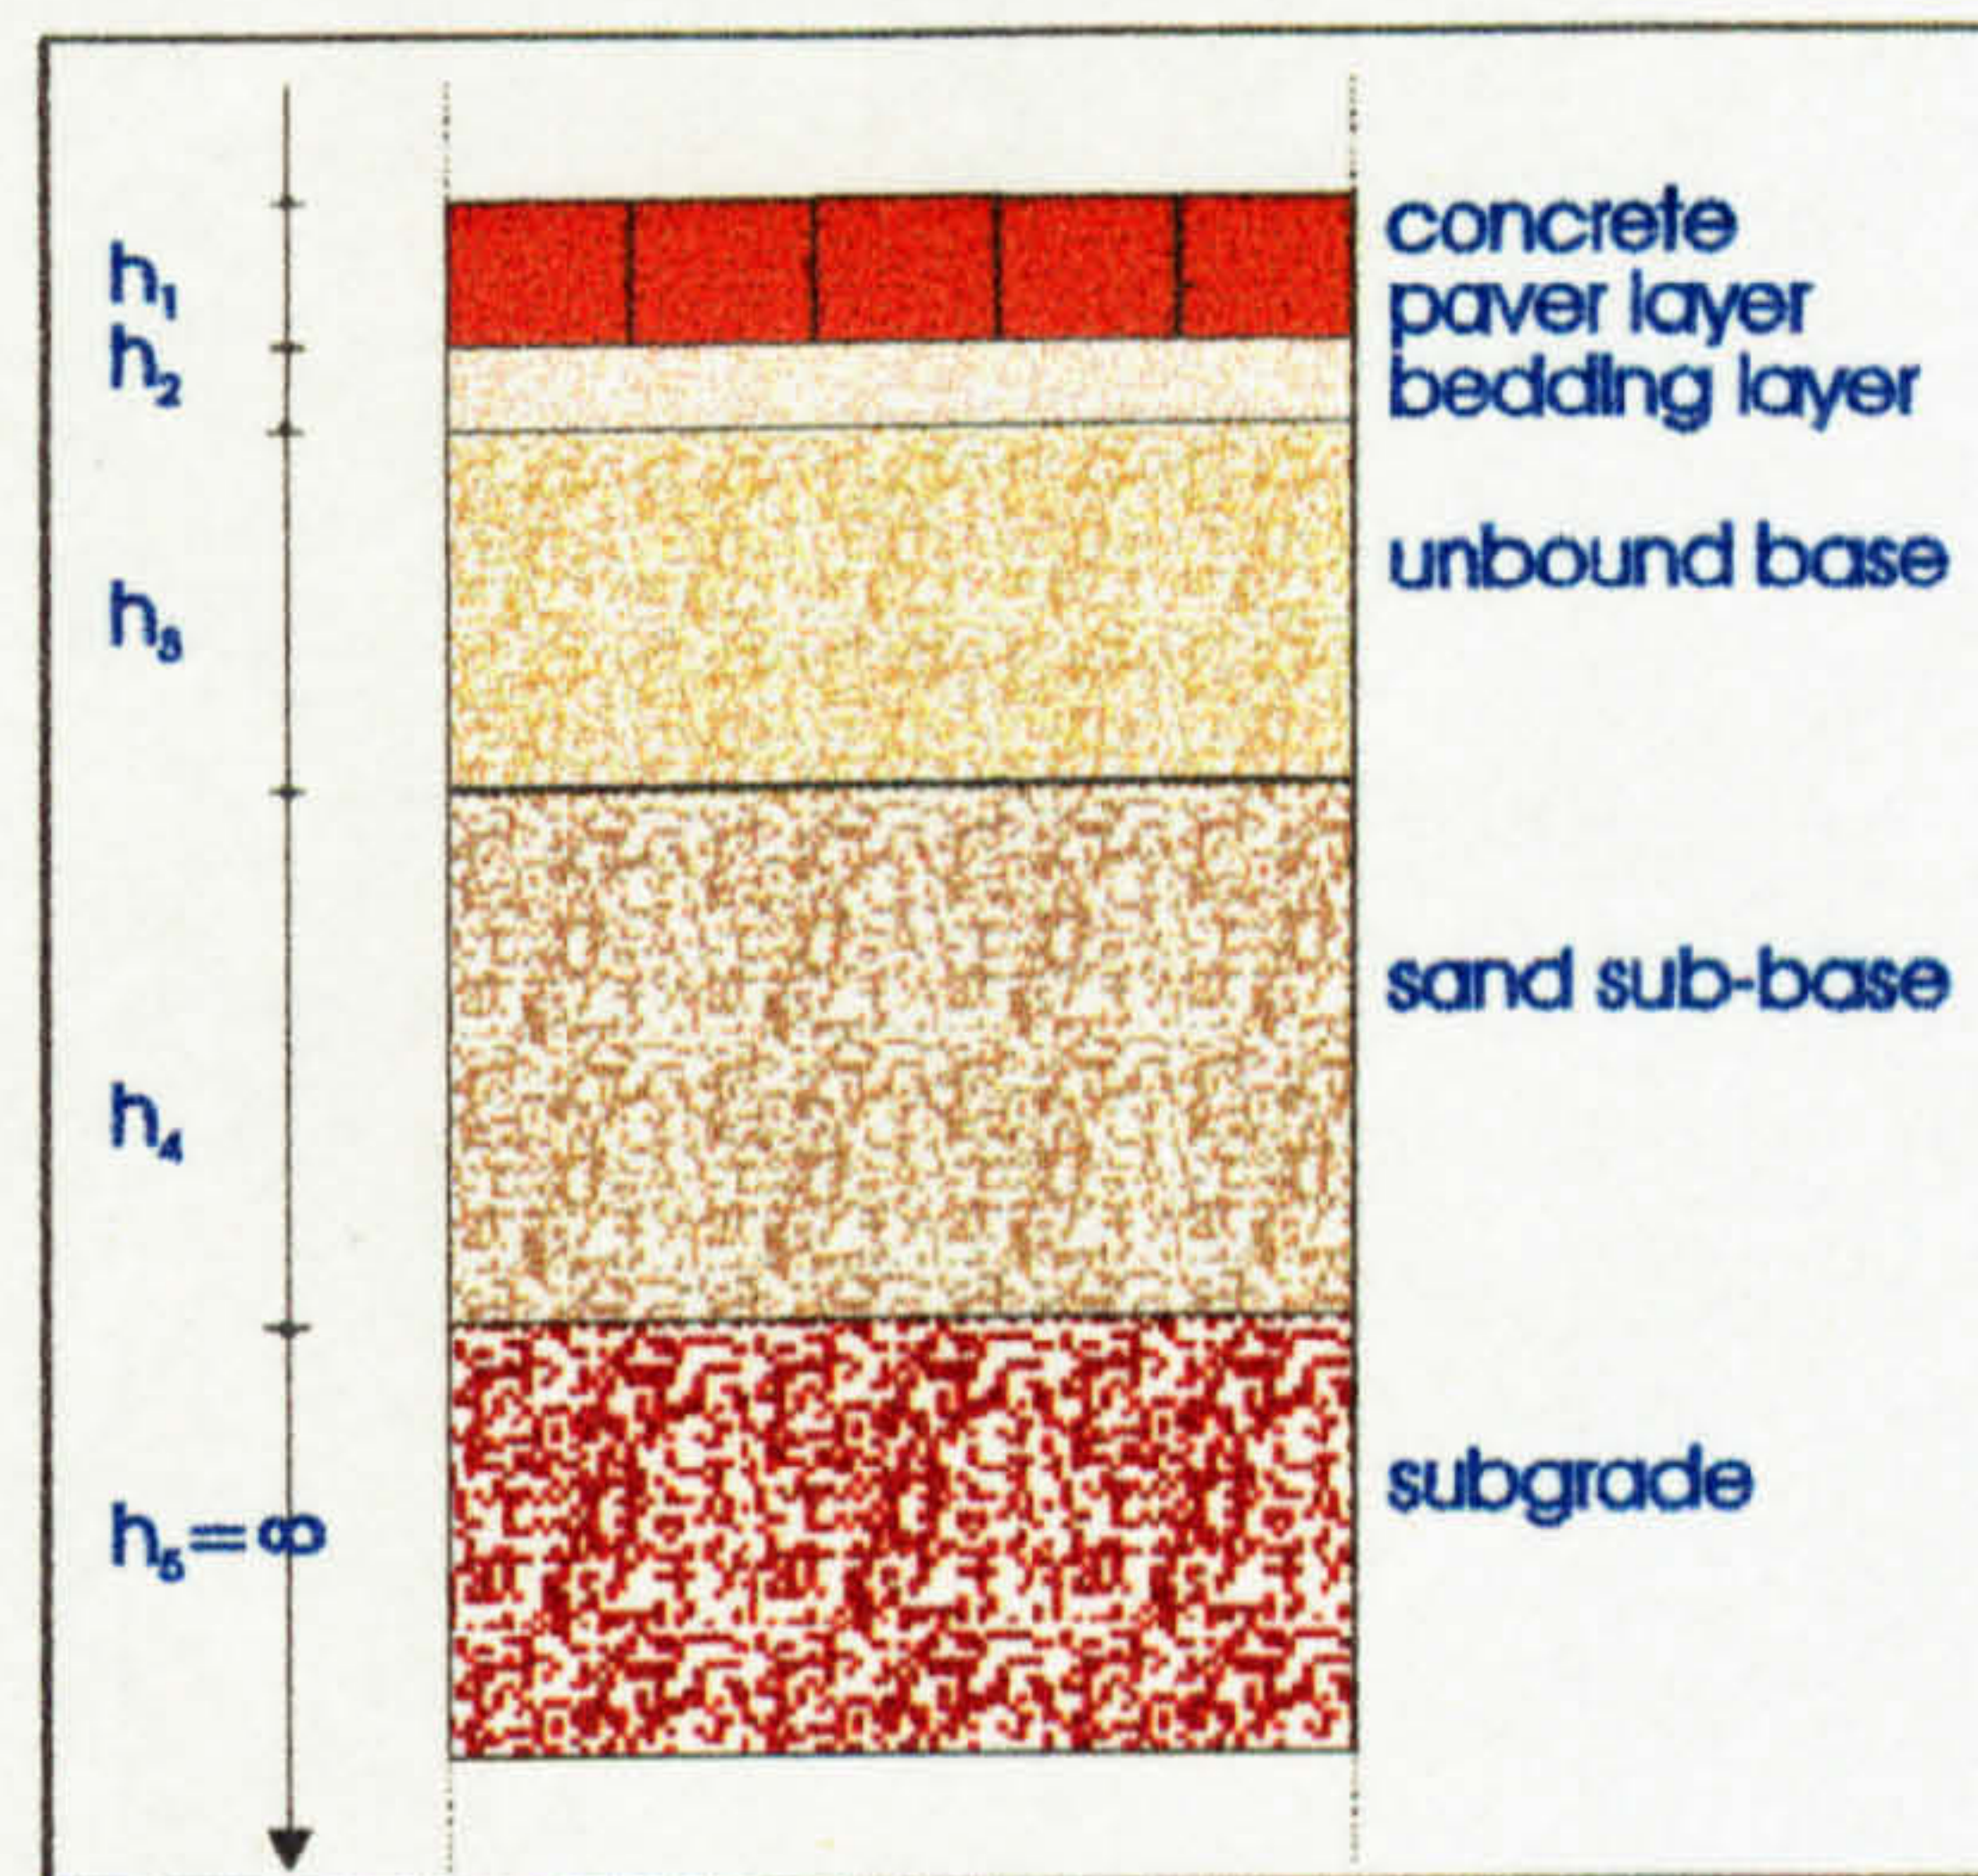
Concrete paver pavement structure used in the Dutch study⁵.
